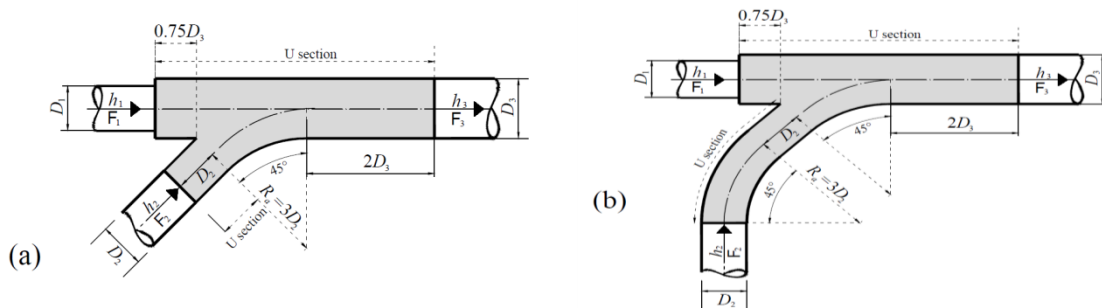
Scheme of junction manhole, (a) plan view for $\theta=45^\circ$, (b) plan view for $\theta=90^\circ$. Grey: U-shaped portion; white: circular conduit portion.
